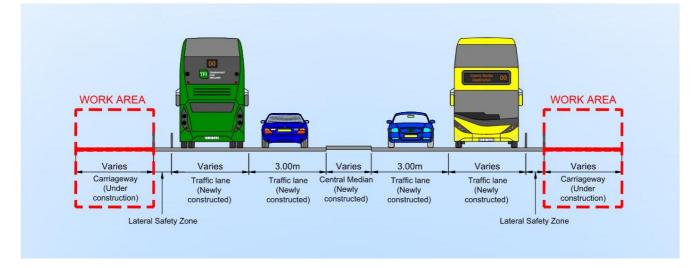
Traffic Management Cross Section, Section 2b – Stage 2
